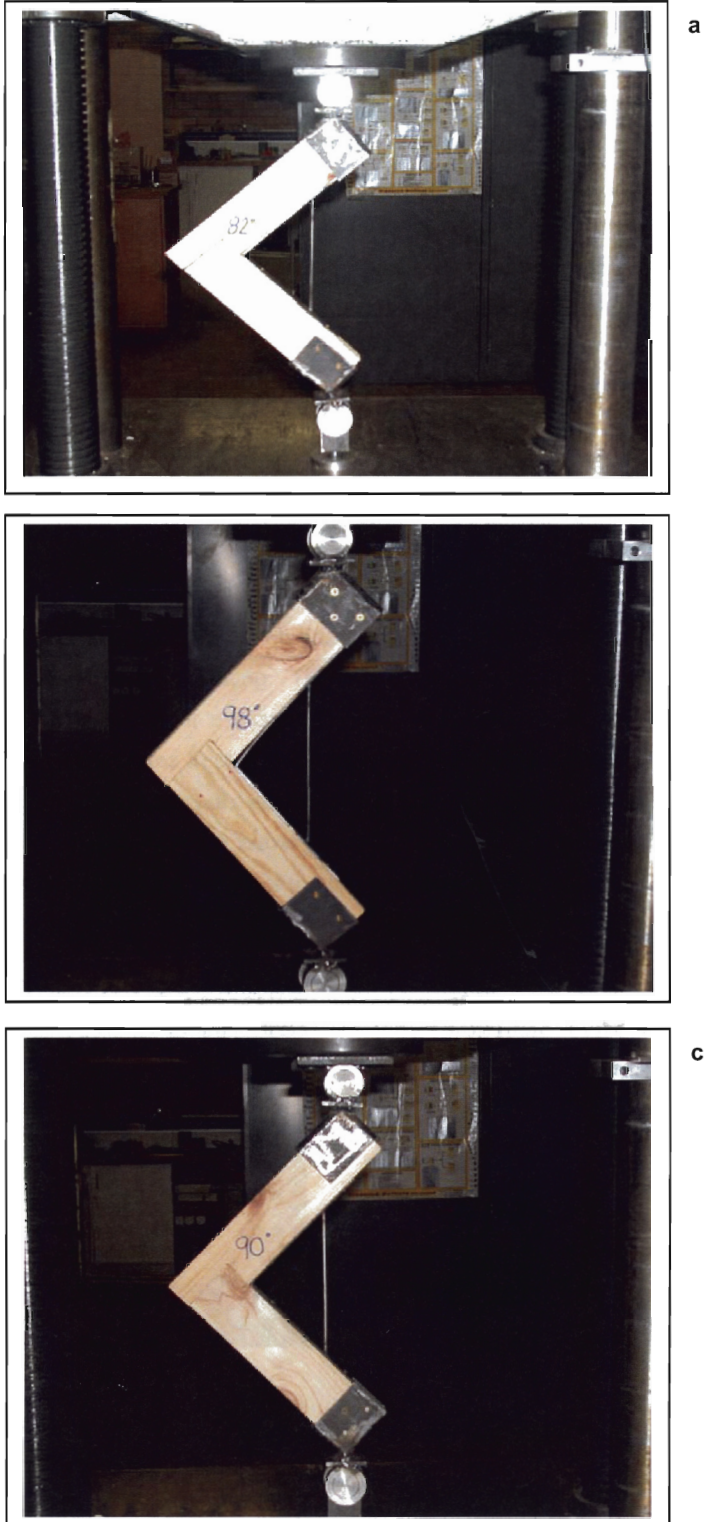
Actual wall corner joint specimens with timber frame and metal brackets; a. 82-degree corner joint, b. 90-degree corner joint and c. 98-degree corner joint.
